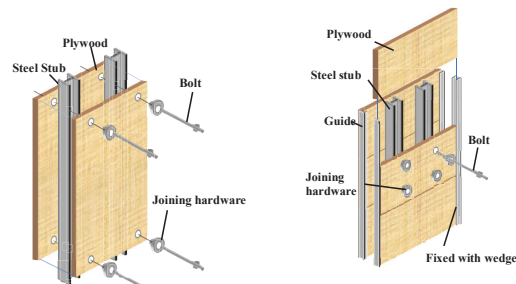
Configuration of sandwiched panel of steel stub and plywood (previous model)
